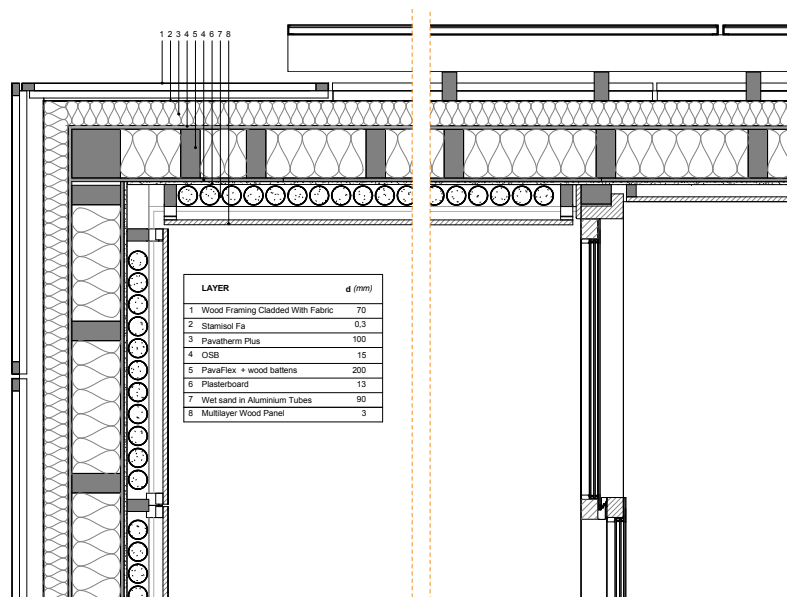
Med in Italy house construction details (wall – horizontal section).¹³⁰
